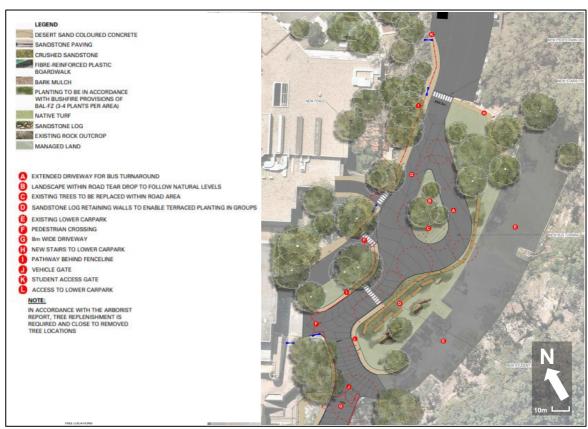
| Approved Landscape design Part 2 (Source: Stamped Plans 2020)
